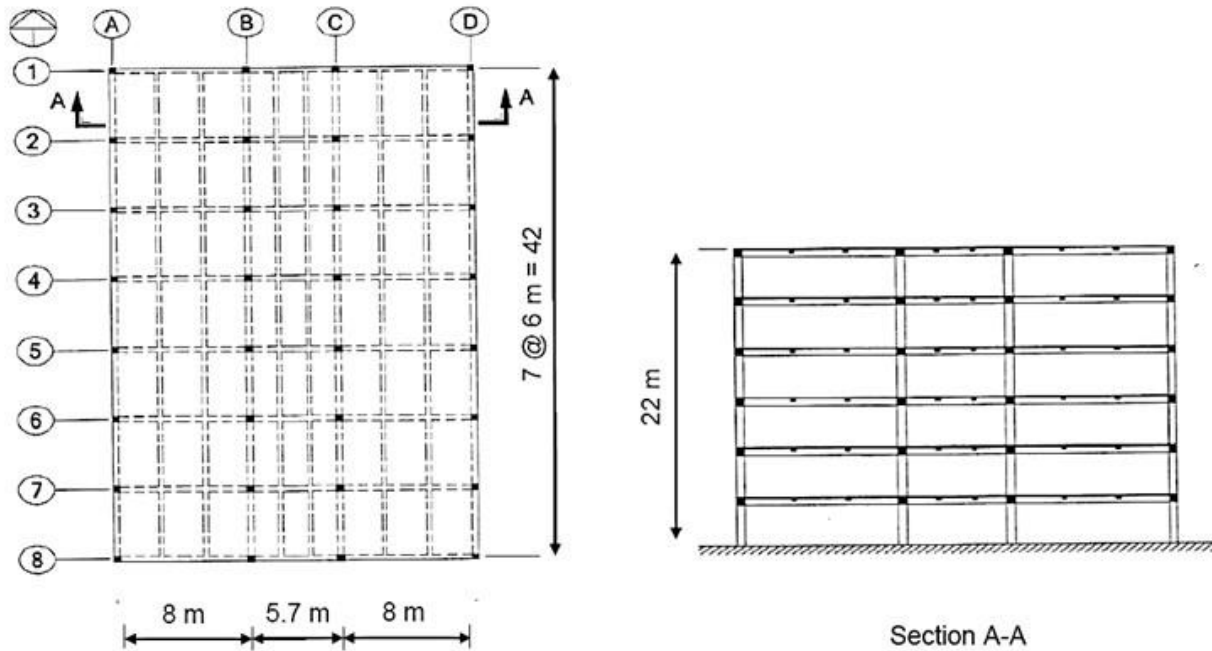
Plan and elevation views of the prototype frame structure (Al-Sadoon, 2016)
